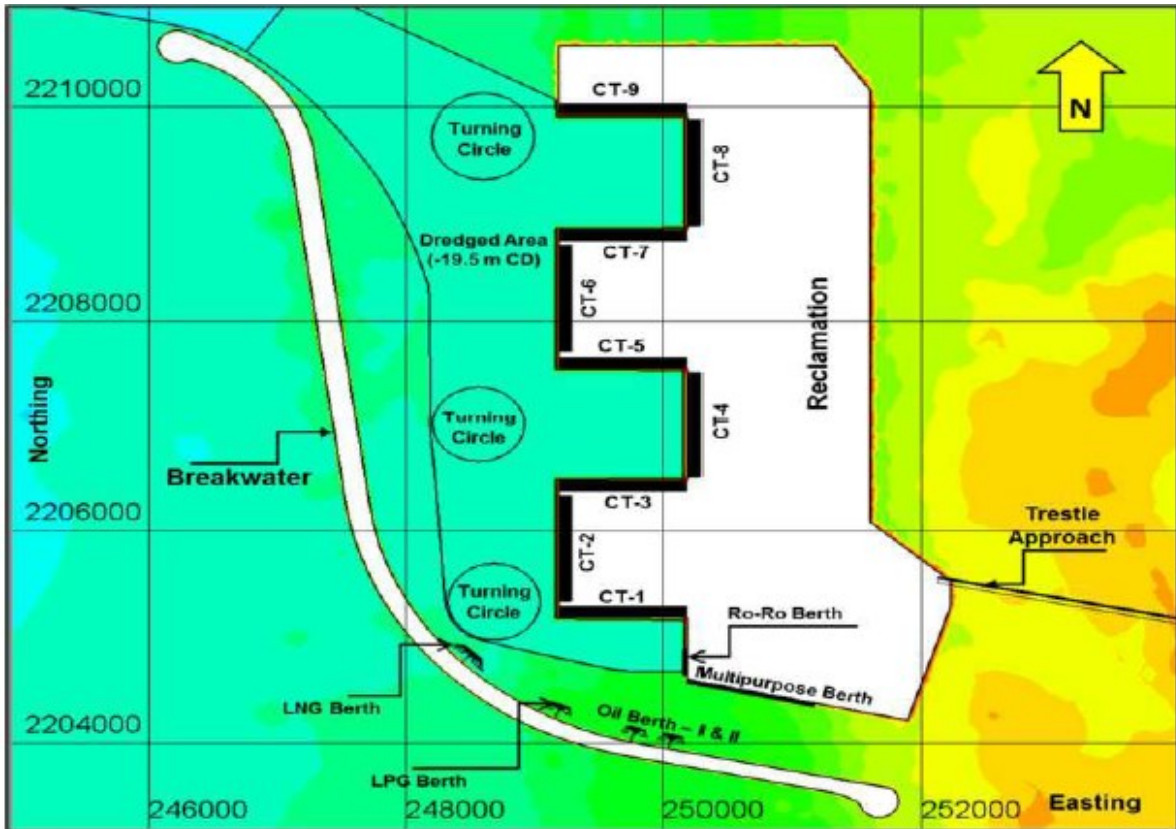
Locations of various berths in Modified Revised Master Plan Layout
